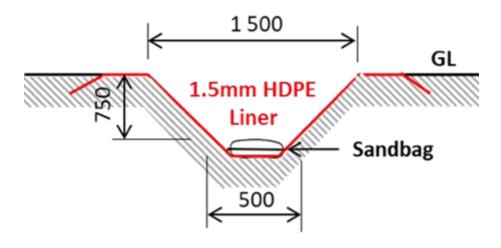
Sealing of the open drains Underfloor drainage:
